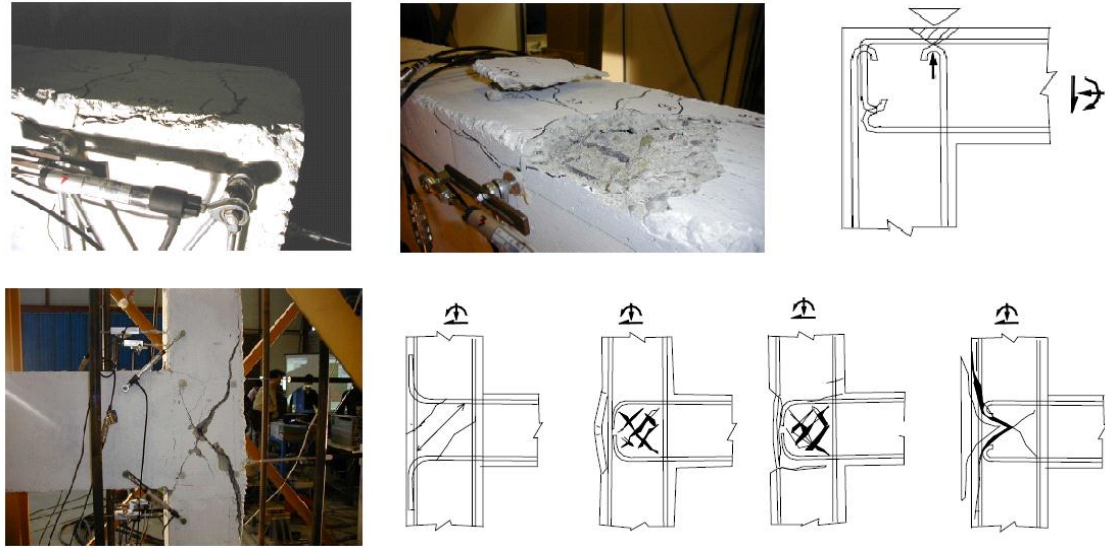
Cracks pattern at failure of T-joint specimen [18]
